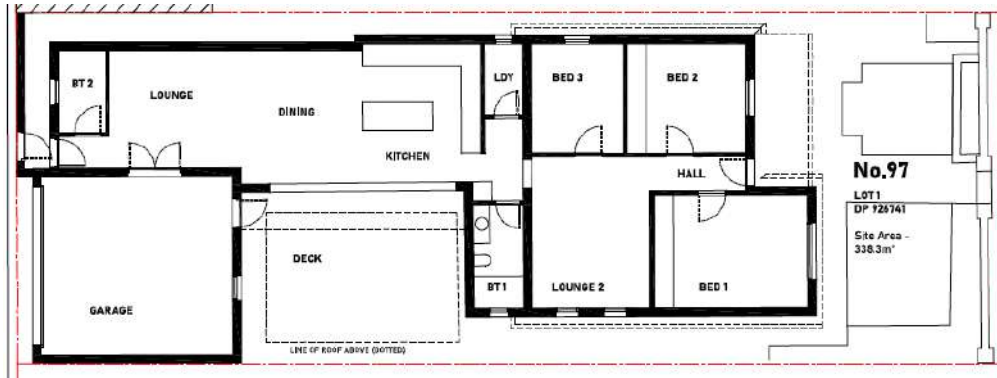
The floor plan of the existing dwelling. Jon Jacka Architects, 2024.
